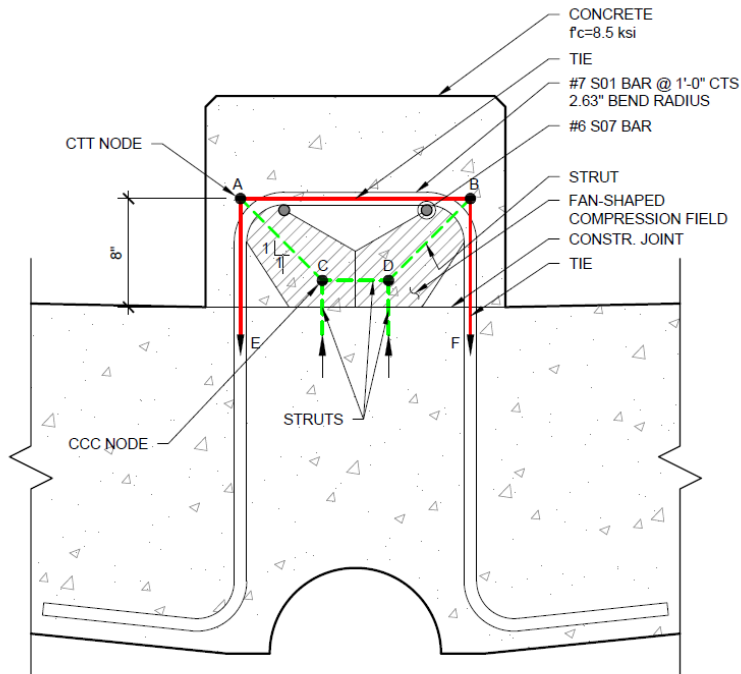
Strut-and-tie model of #7 stirrups across construction joint
